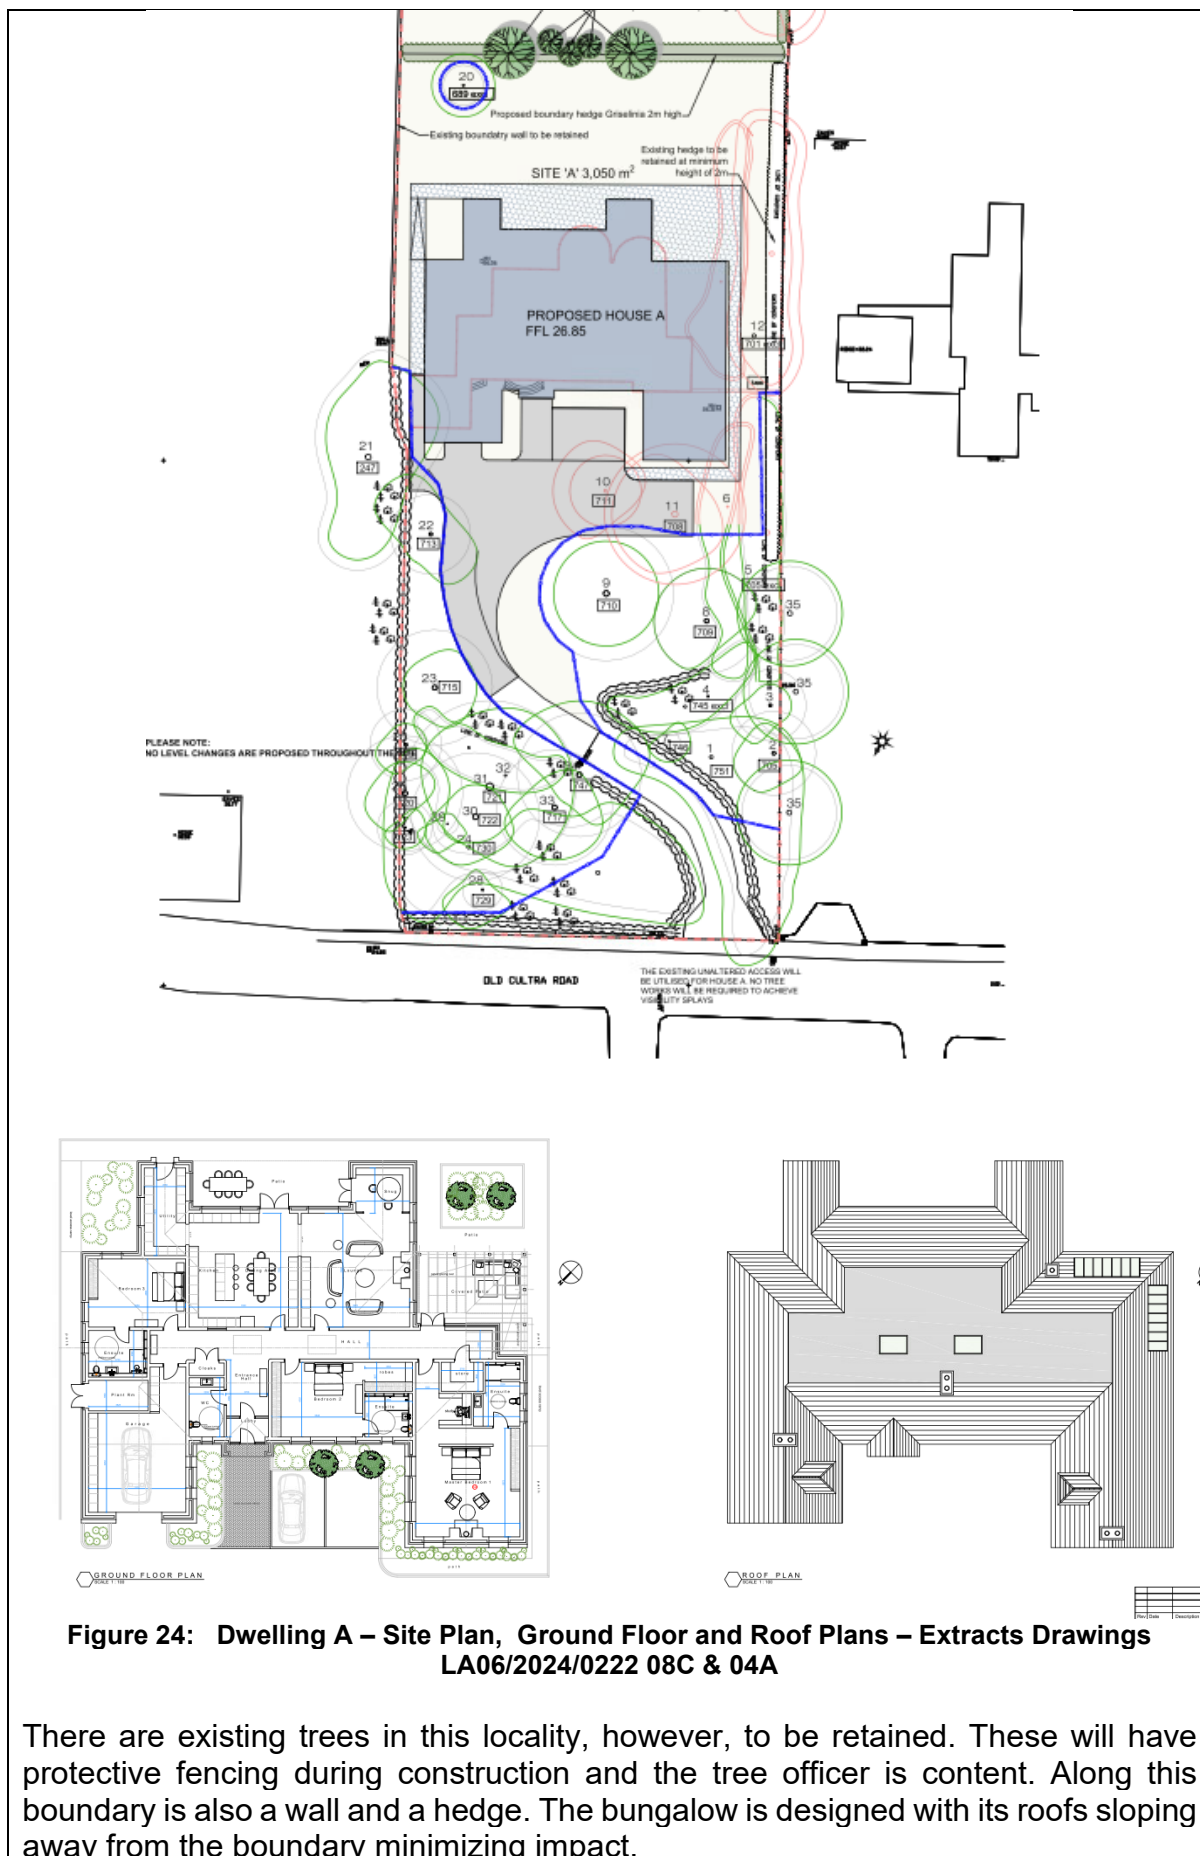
Dwelling A – Site Plan, Ground Floor and Roof Plans – Extracts Drawings LA06/2024/0222 08C & 04A
